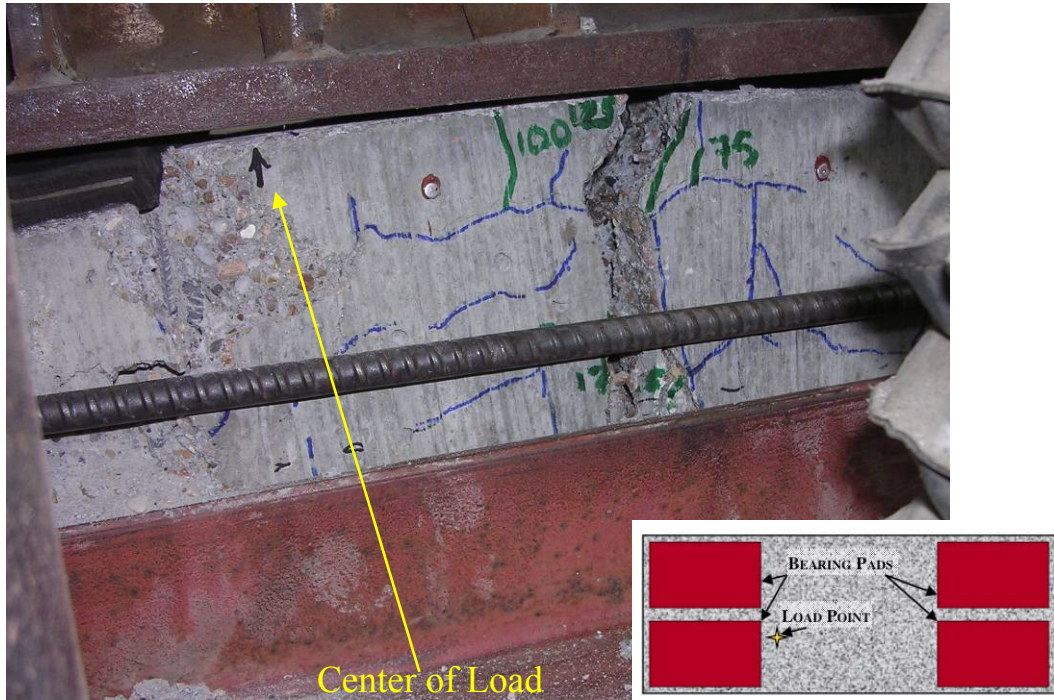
Center Crack Opened in Post-tensioned #2 Specimen
